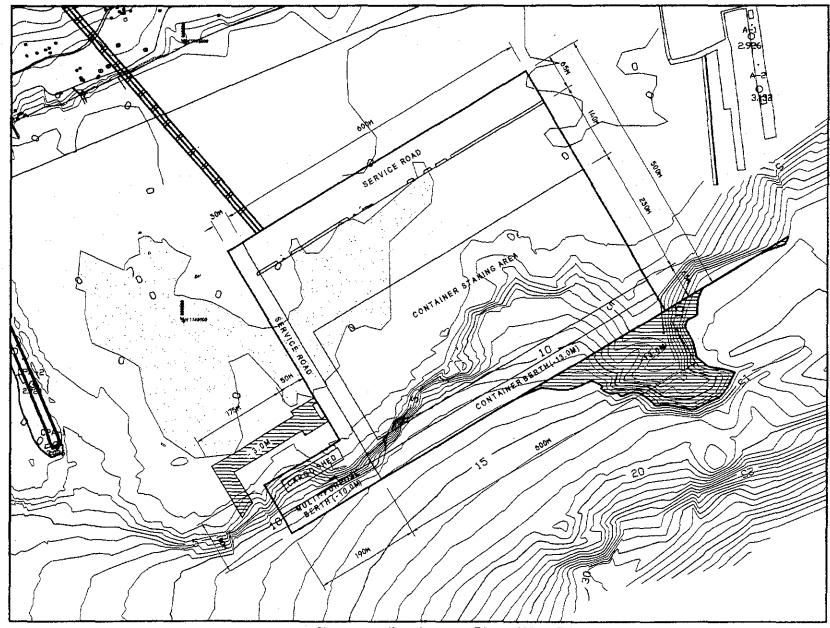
Short-term Development Plan of New Cebu Port
